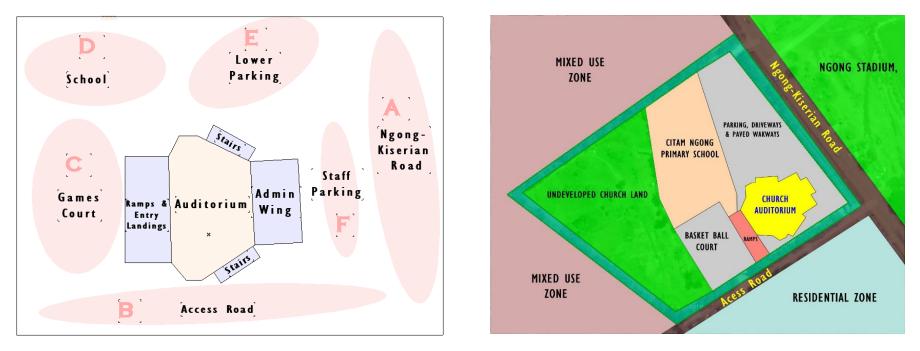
CITAM Ngong – Site Layout & Adjacent zones.
